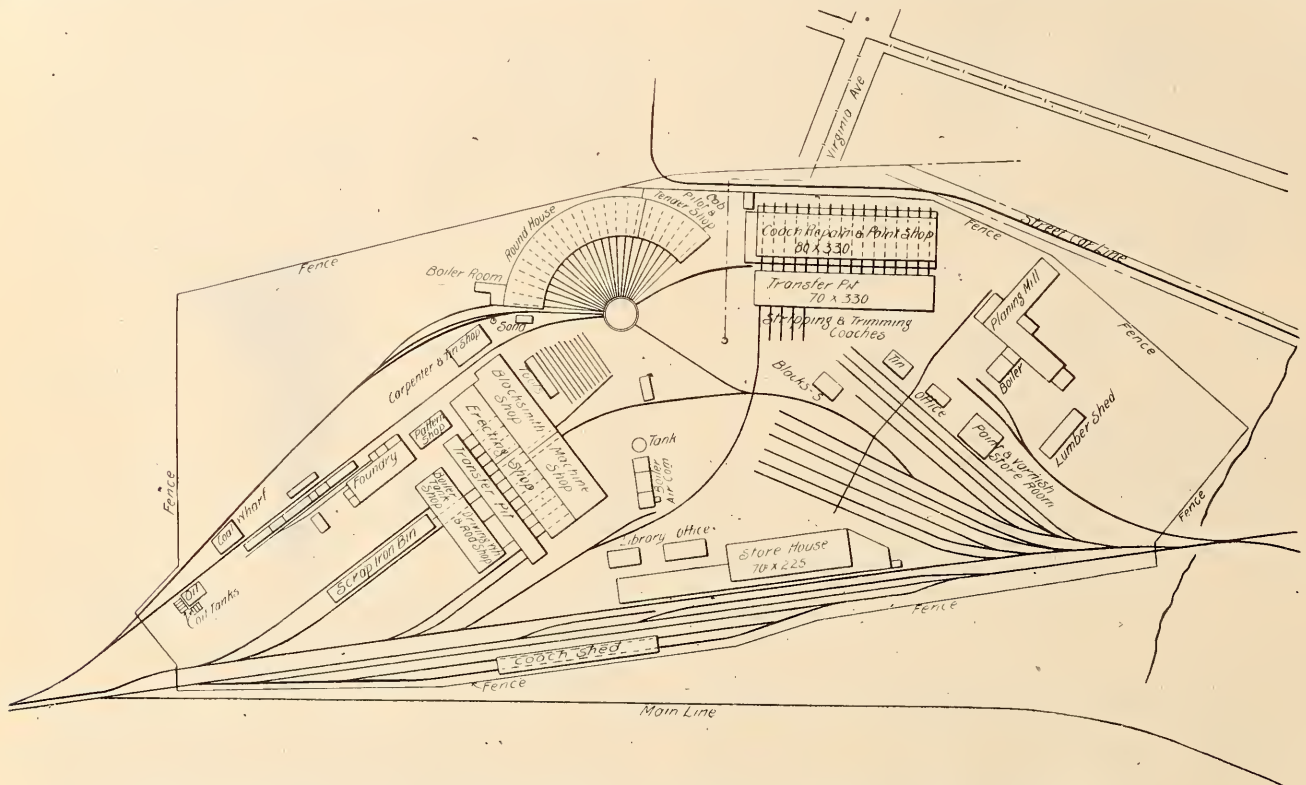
GENERAL LAYOUT OF SHOP PLANT OF SEABOARD AIR LINE AT PORTSMOUTH, VA.
